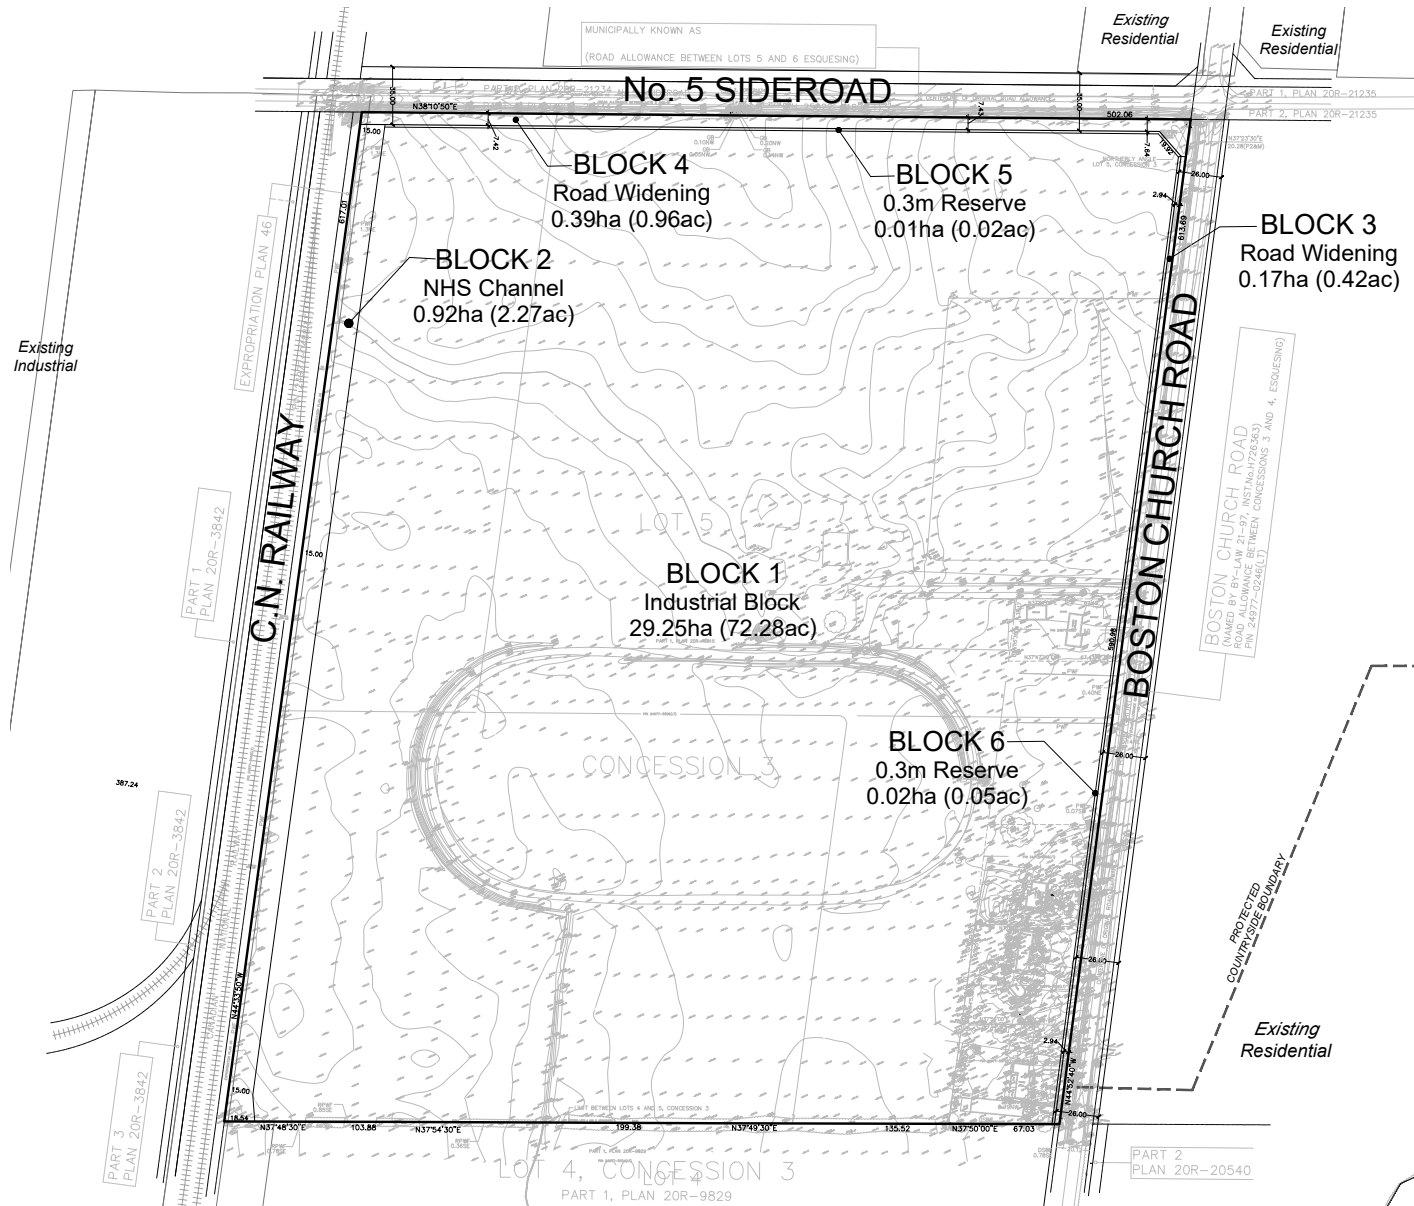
West Draft Plan of Subdivision (West Block - December, 2023)
